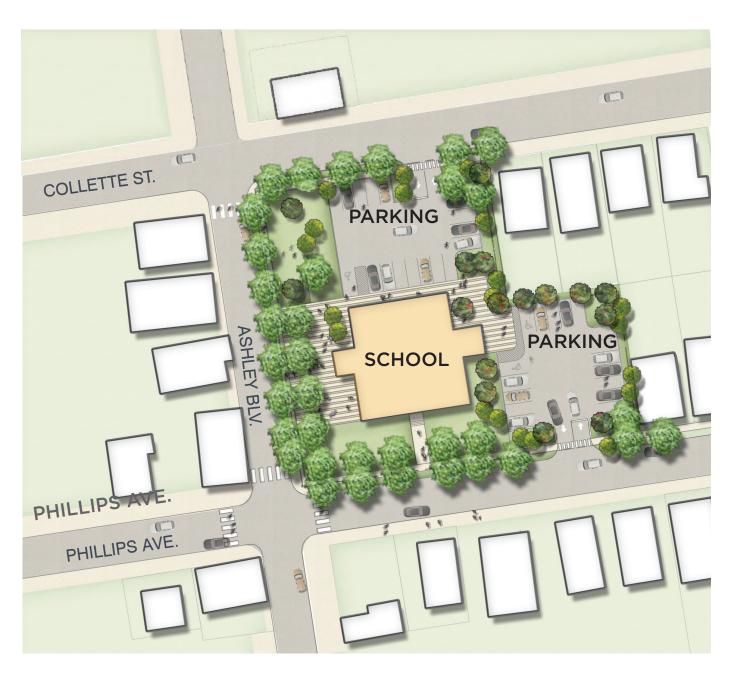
Proposed reuse plan for the Phillips Avenue School and adjacent lot.
